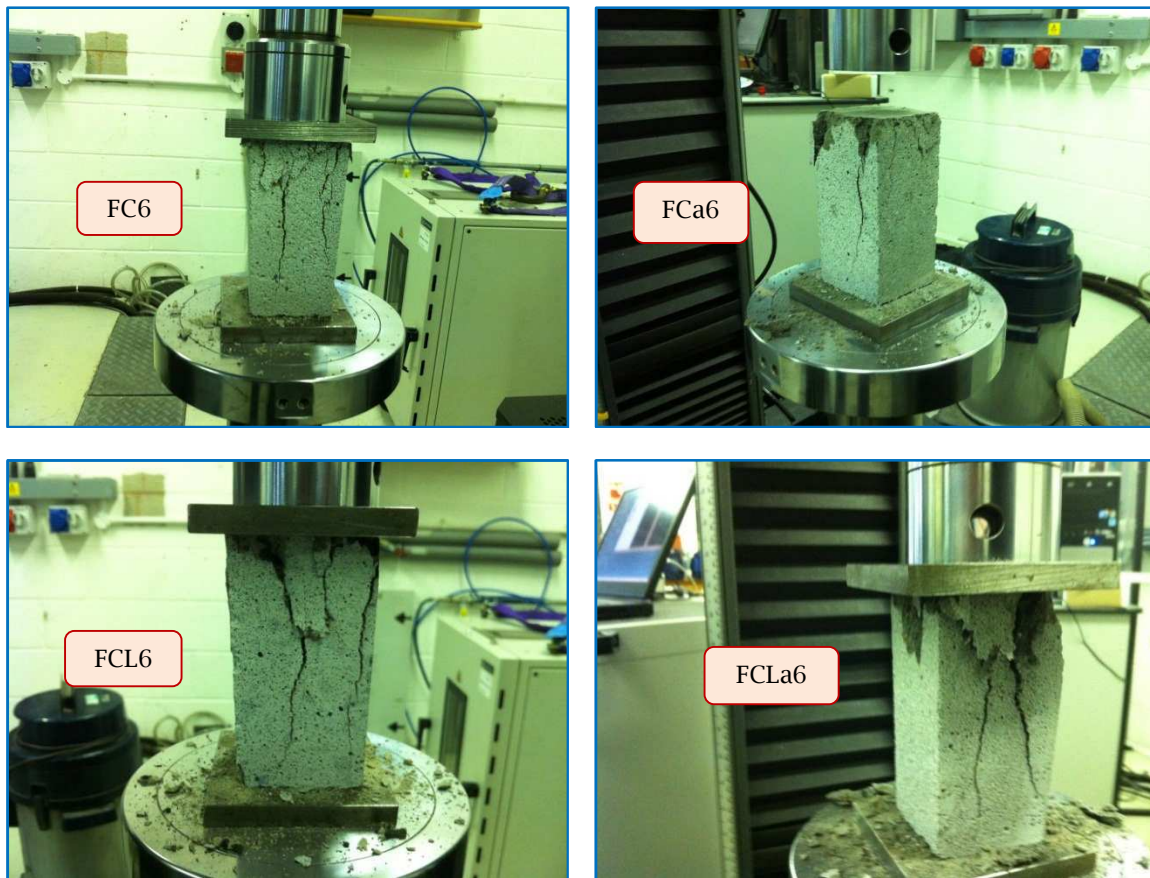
Failure pattern of 1600 kg/m³ mixes
